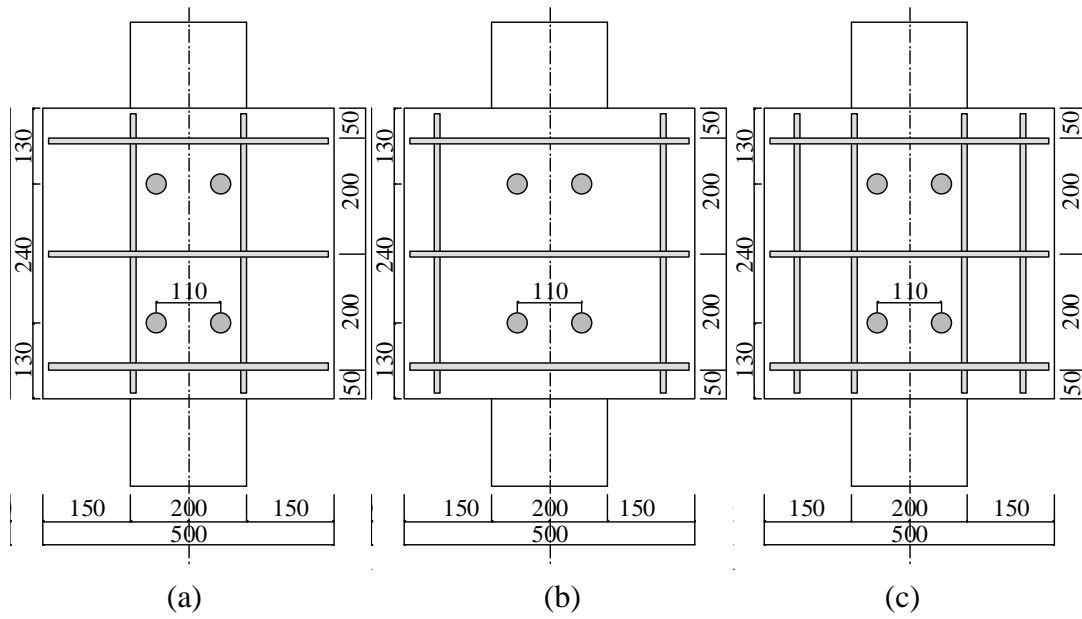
Arrangement of Rebar (unit: mm): (a) No. 8, (b) No. 9, (c) No. 10.
